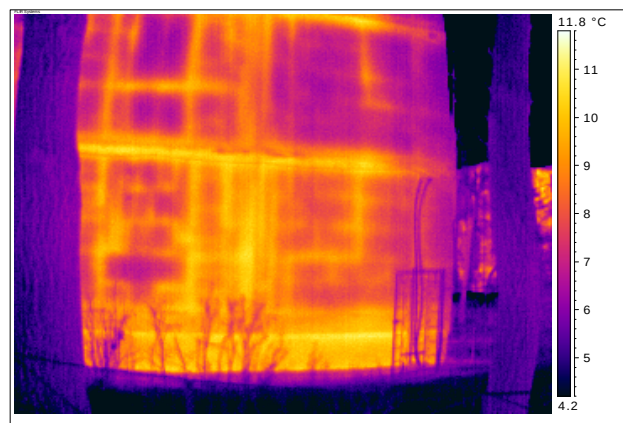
Large panel wall – BCA (autoclaved lightweight concrete) strips insulation
